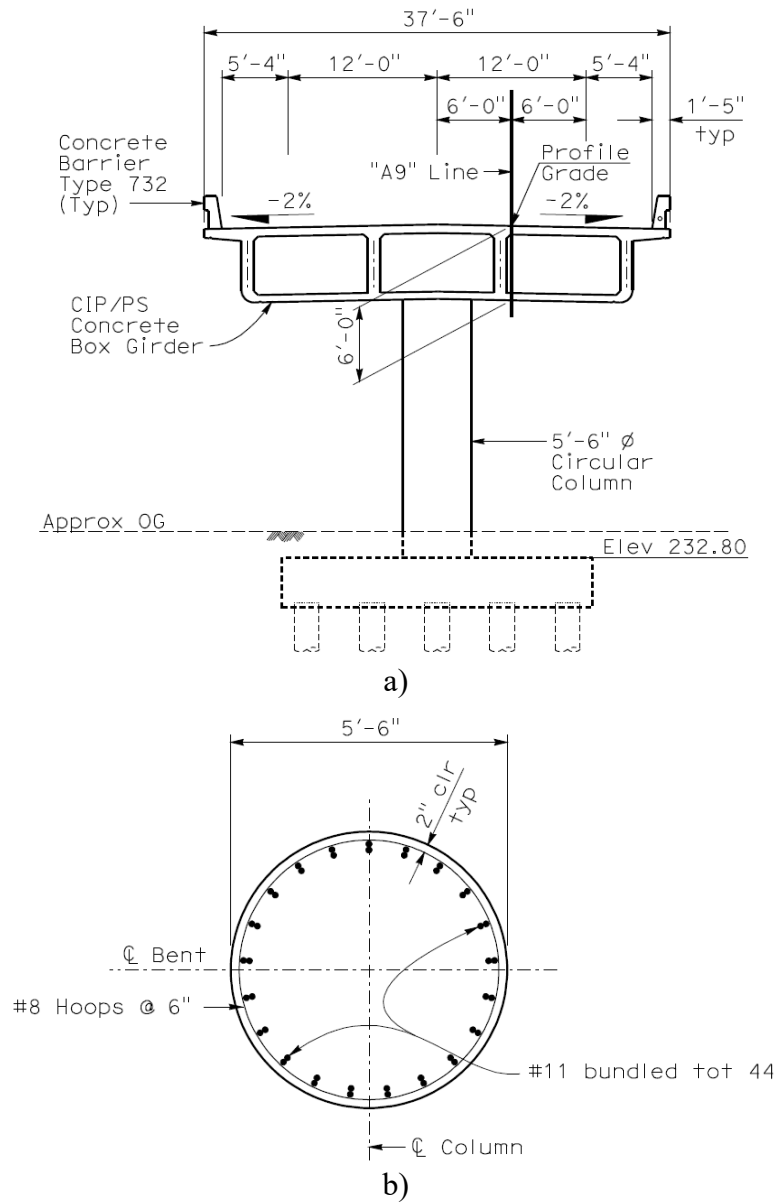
Sectional details of OSB2: (a) deck; (b) circular column cross section (Caltrans 2012)
